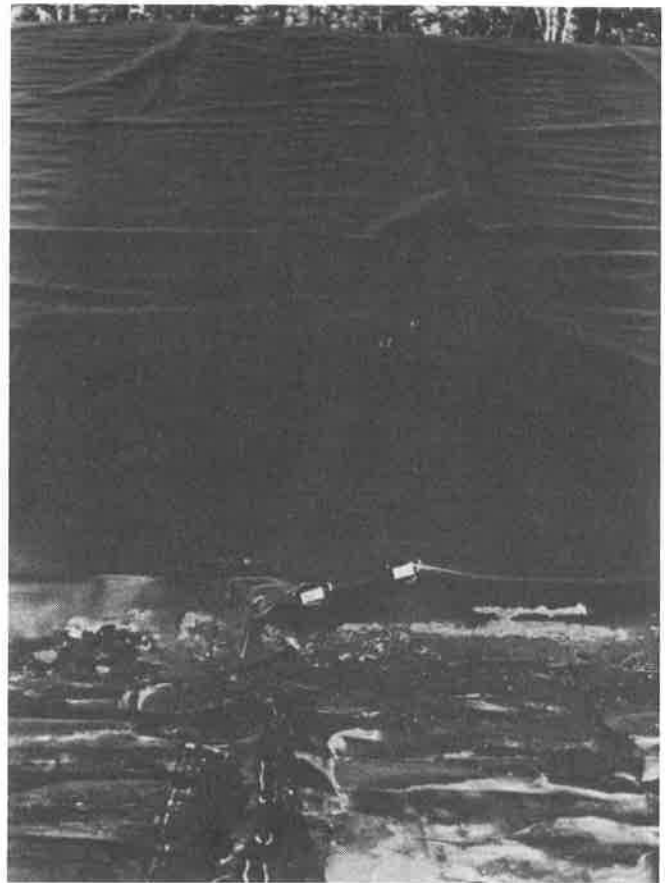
Cracks in folded wrinkles (at white labels) and on bottom unfolded wrinkle (outlined by white pen).
